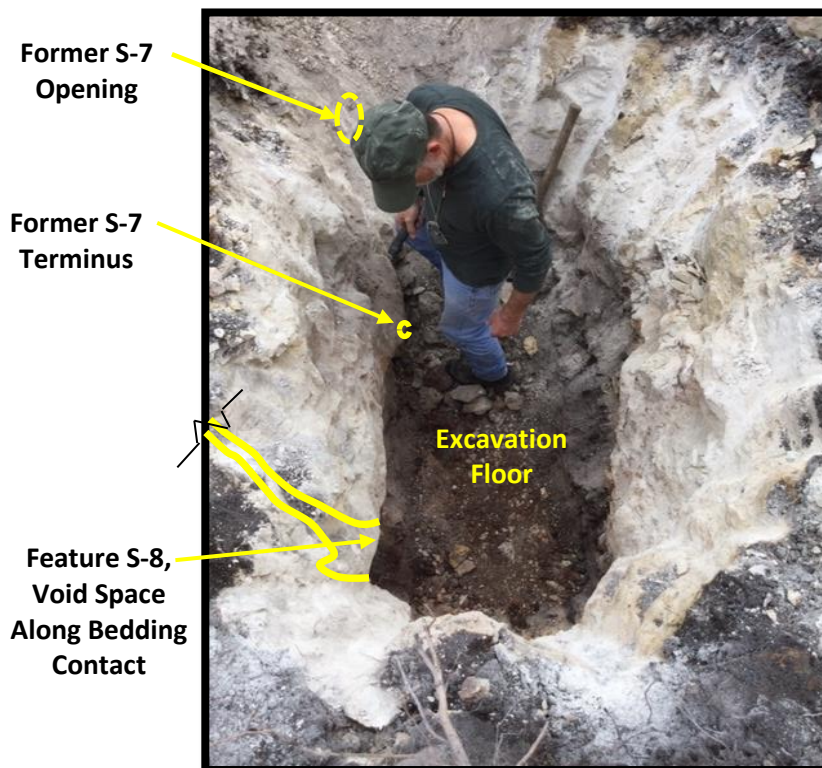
Final excavation extent. Feature S-7 is completely removed and was determined to be terminated at the weathered limestone contact zone (excavation floor).
